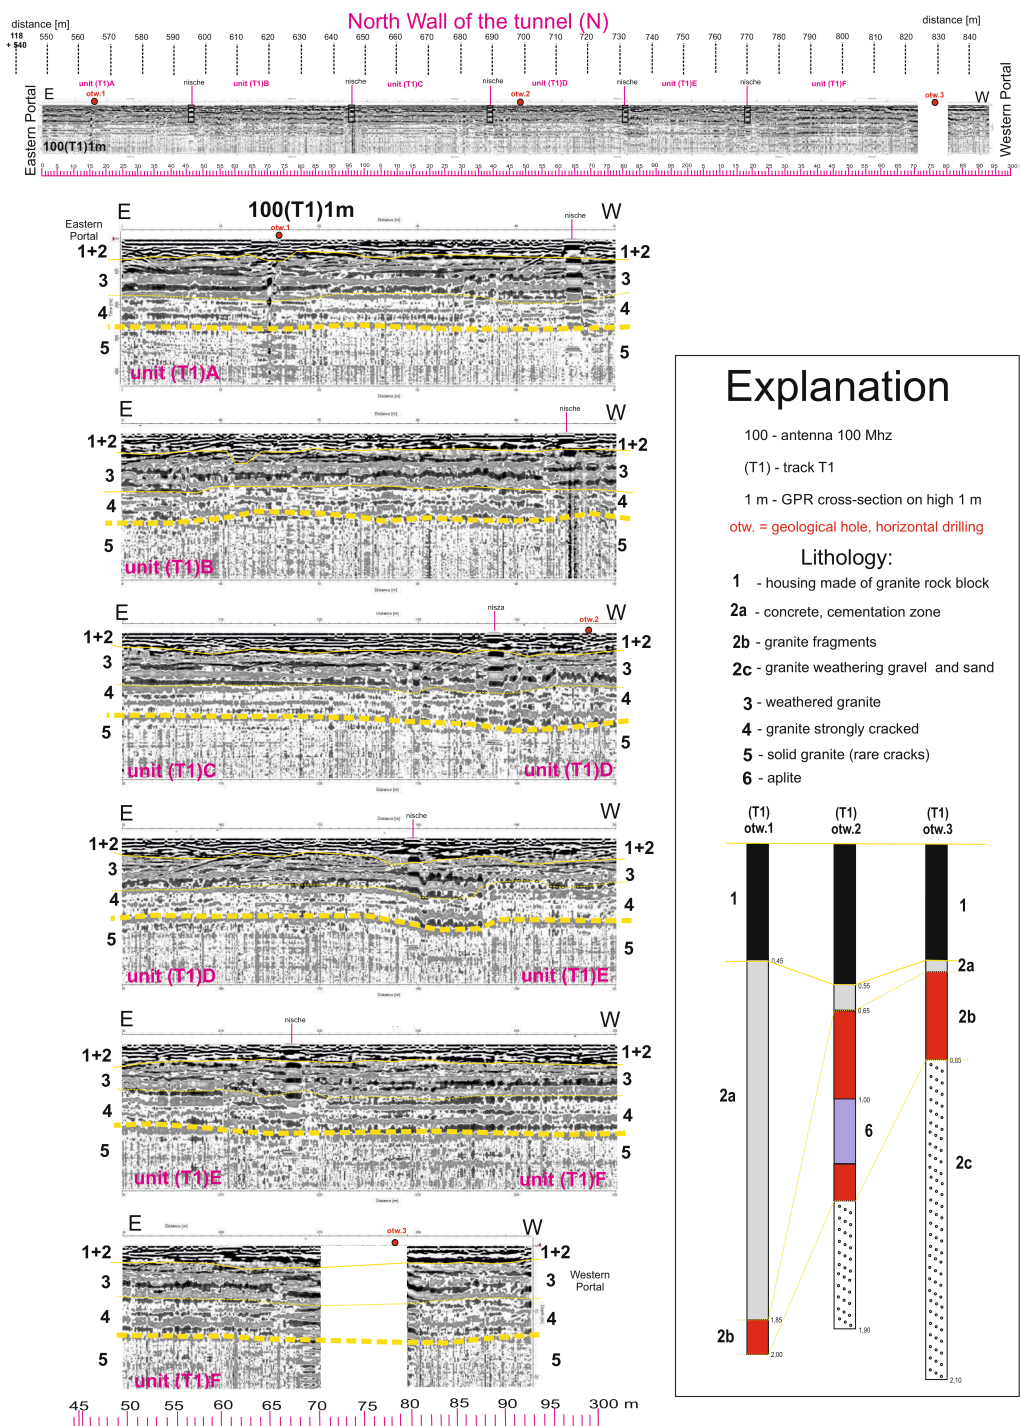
GPR cross-section obtained with 100 MHz antennas along the northern wall of the tunnel, at the T1 track and at a height of 1 m from the tunnel floor.
